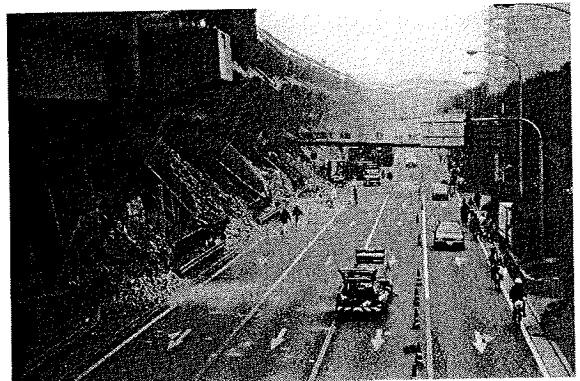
Collapse of 18-span Bridges from Kobe Side, Fukae, Route 3, Kobe Line, Hanshin Expressway
